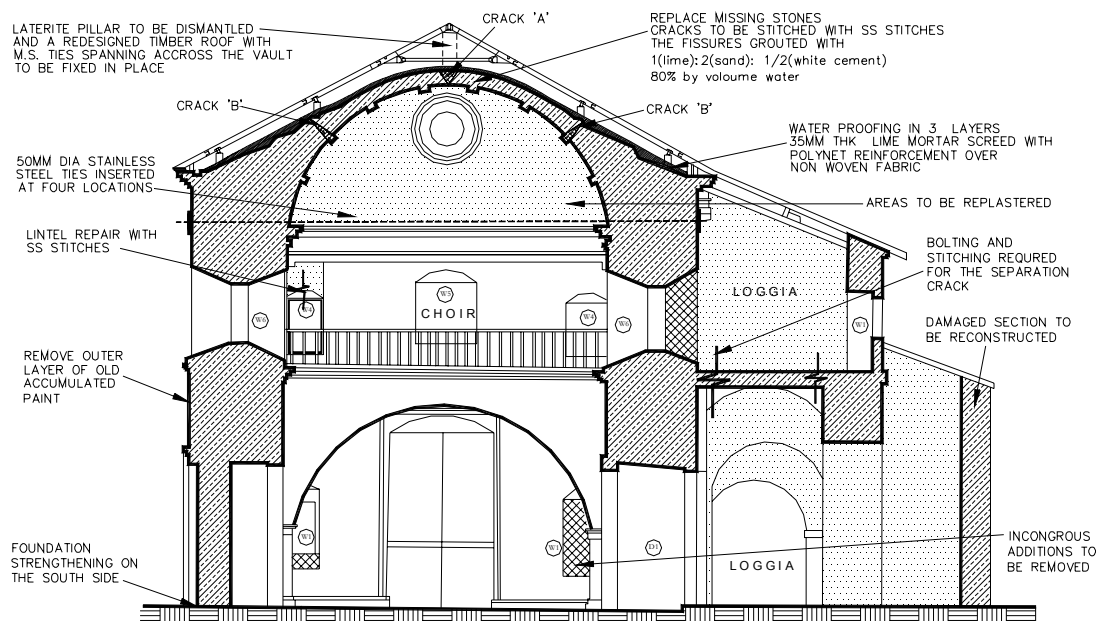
Section showing the cracking of vault schematically and all the other Structurally distressed areas
